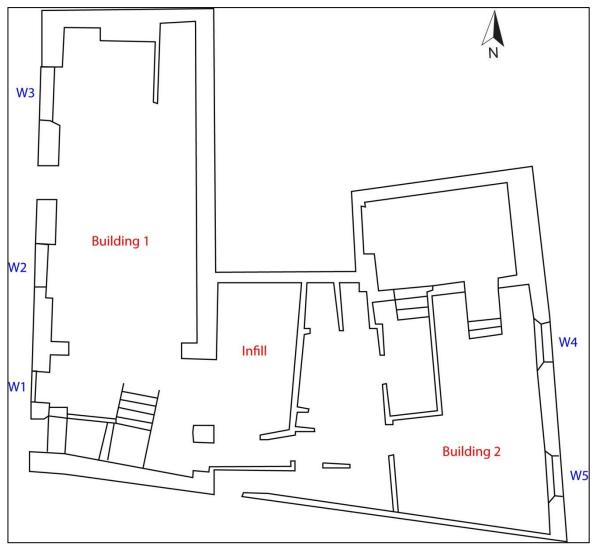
PLAN OF WINDOWS ON THE GROUND FLOOR.
